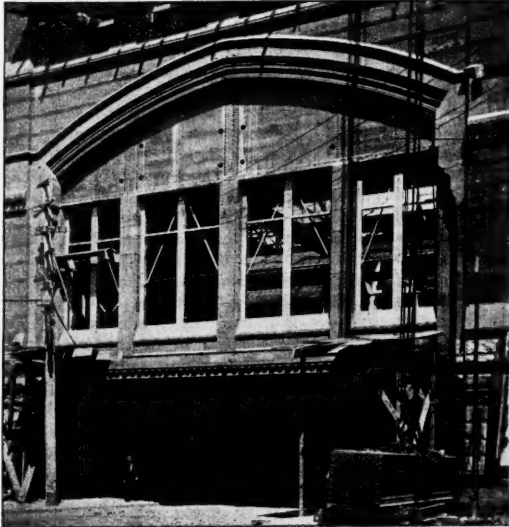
58-Ft. Triple Plate Girder—Broad Street Station.
